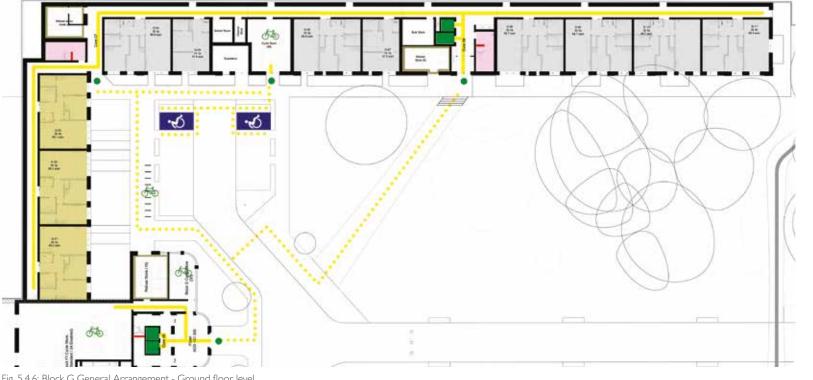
Block G General Arrangement - Ground floor level
